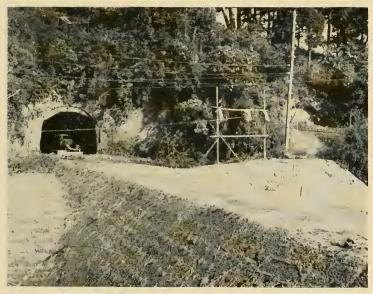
Entrances to Oami plant. Note new roads camouflaged entrance.
